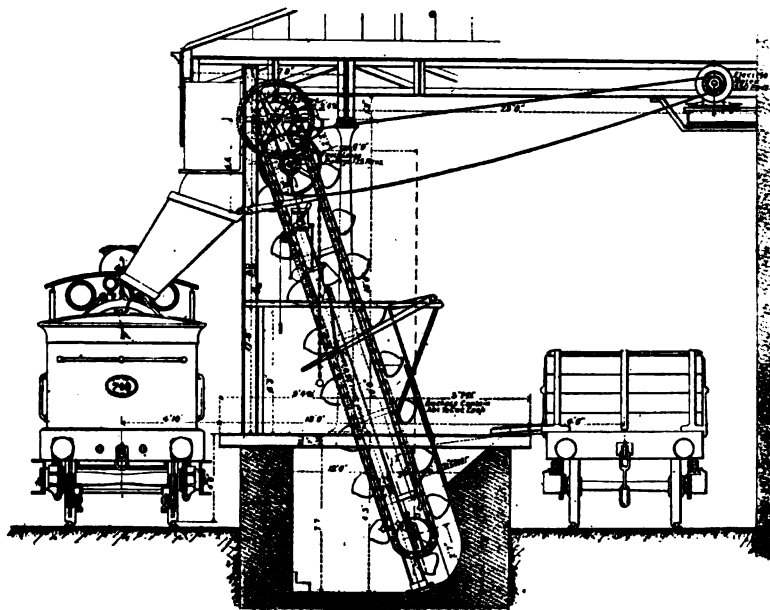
Elevator for Coaling Railway Engines at Slades Green.
